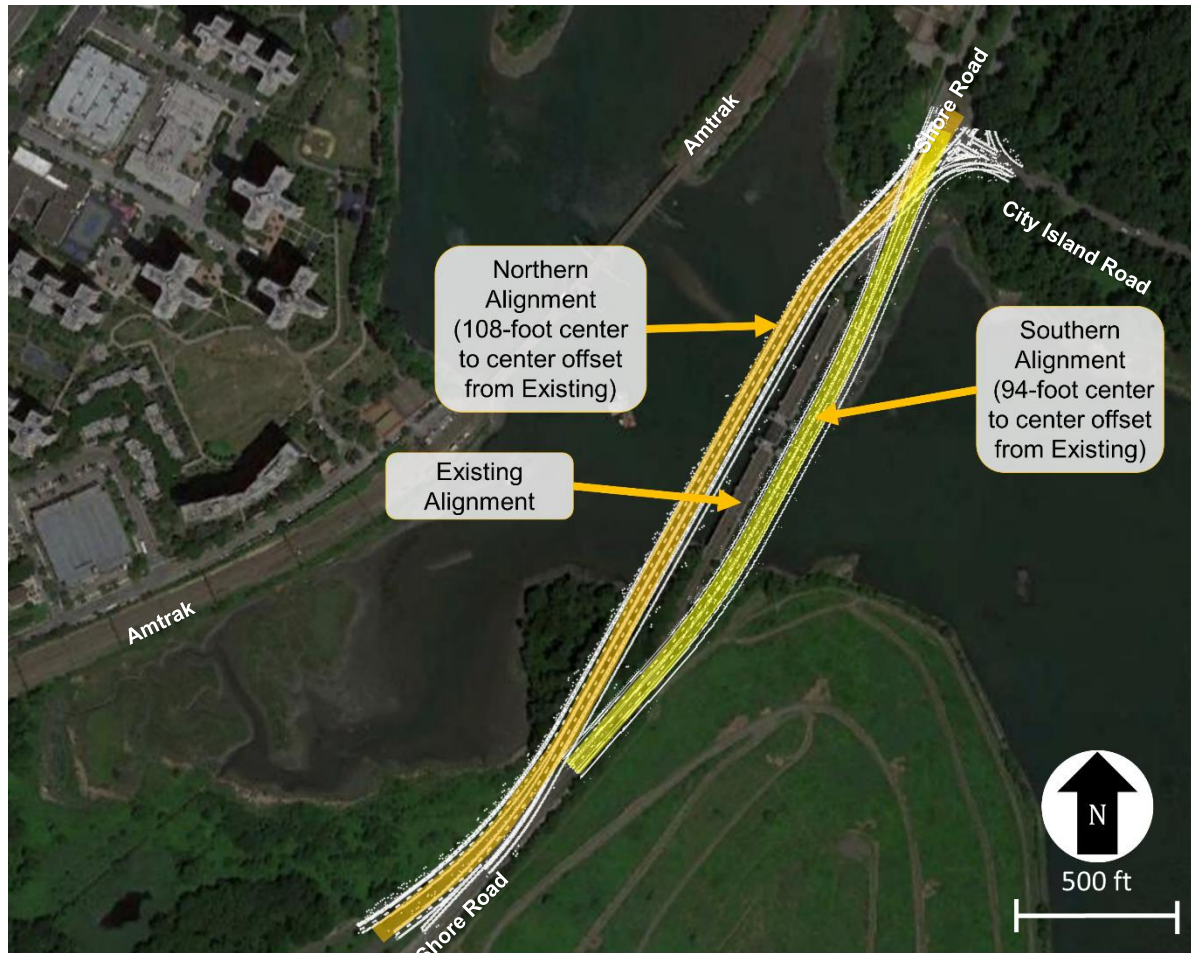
Concept Alignments for the Shore Road Bridge (Pelham Bay Parkway Bridge)
